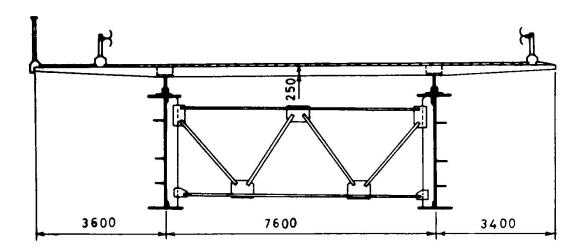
Typical cross section of superstructure using steel embeds for connection of steel to concrete.
